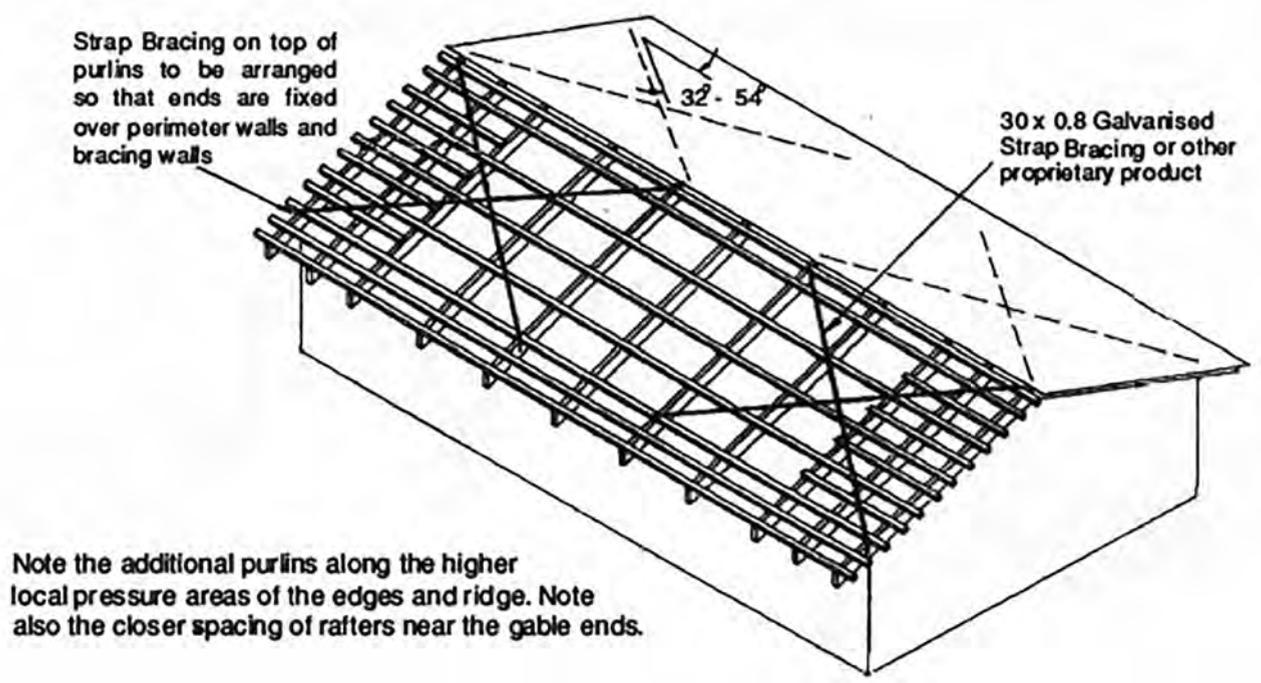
FLAT STRAP BRACING FOR ROOFS
